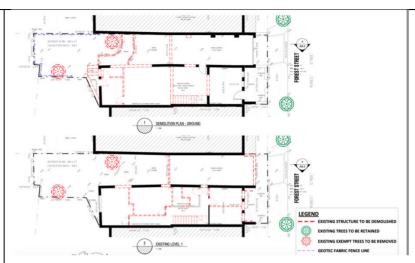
Demolition of portions of the garage and landscaping to the rear of the Site
